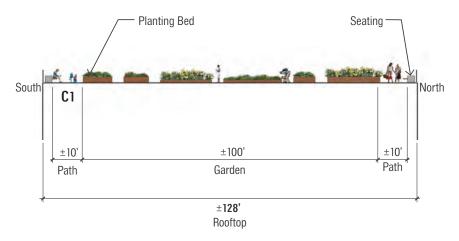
Illustrative Section B-B: Food/Garden Plots
